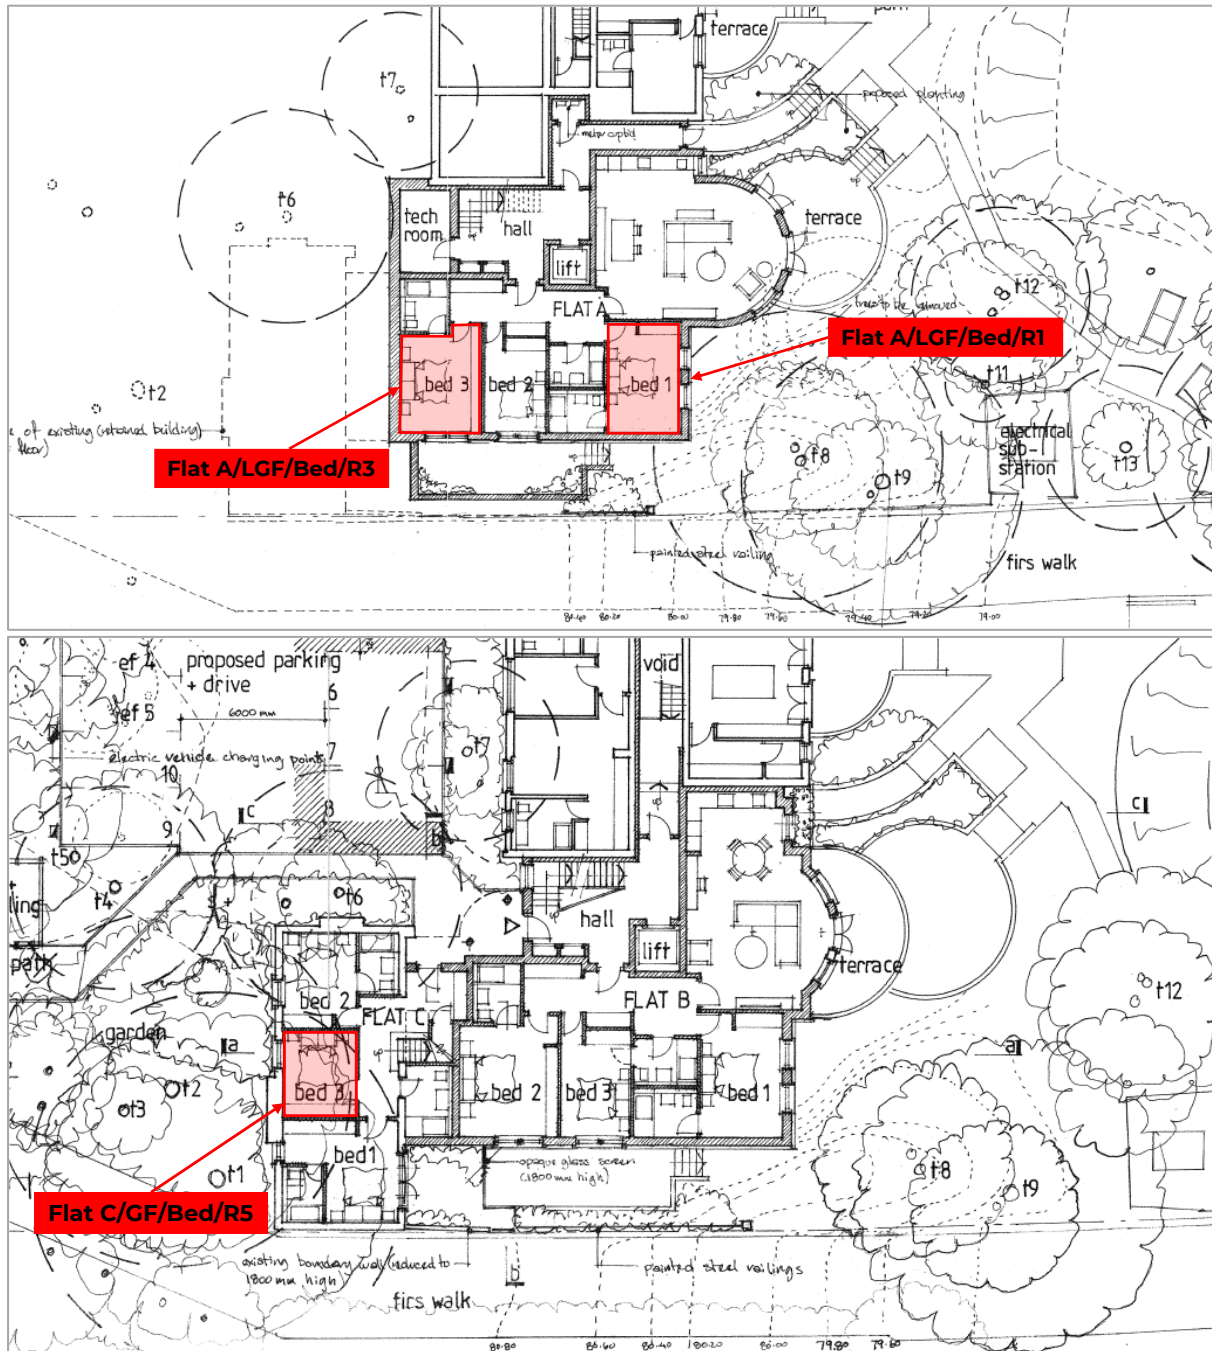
GNP Architects Lower Ground Floor rooms in Flat A (top) and Ground Floor rooms in Flats B and C (bottom) illustrating the rooms impacted by the surrounding trees in the winter (red).
